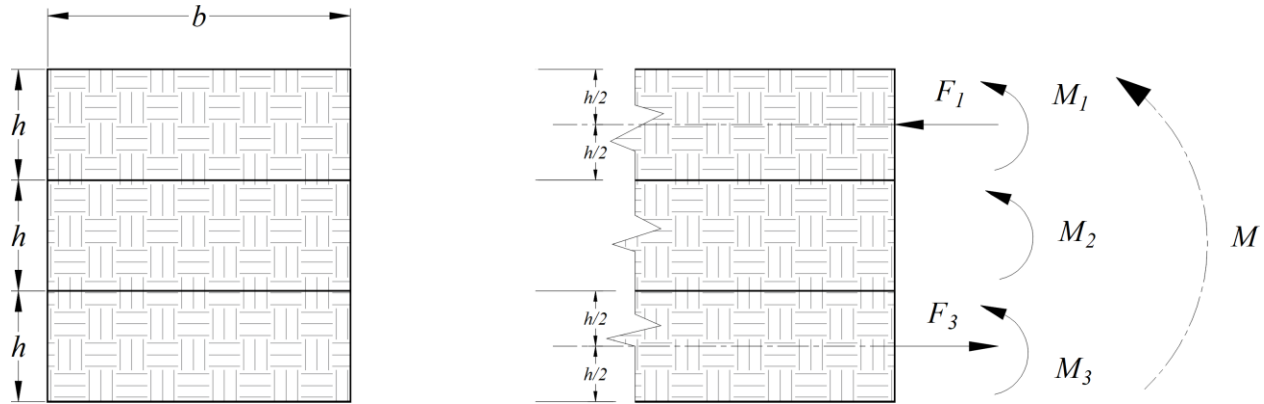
Cross section of three-layer beam under the internal forces [3]
